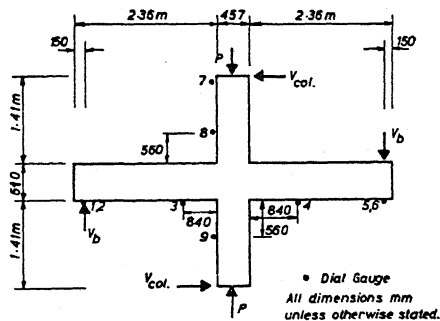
Dimensions and Loading of Test Specimens (5)
